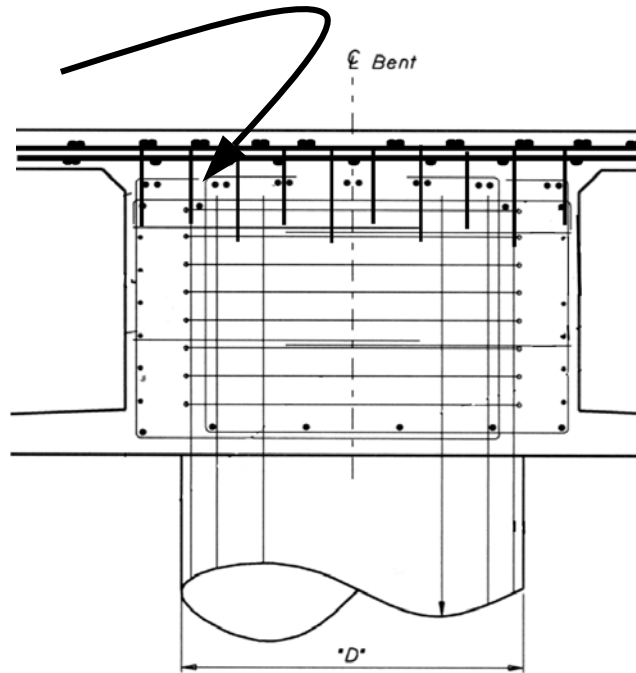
Location of Horizontal Joint Shear Steel
